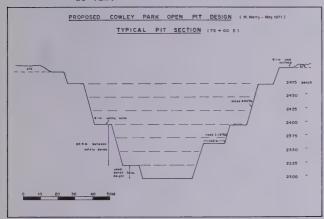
Typical open pit cross-section (proposed 1971 Cowley Park pit by W. Marty) showing width of safety berms and roads, and slope of walls.
